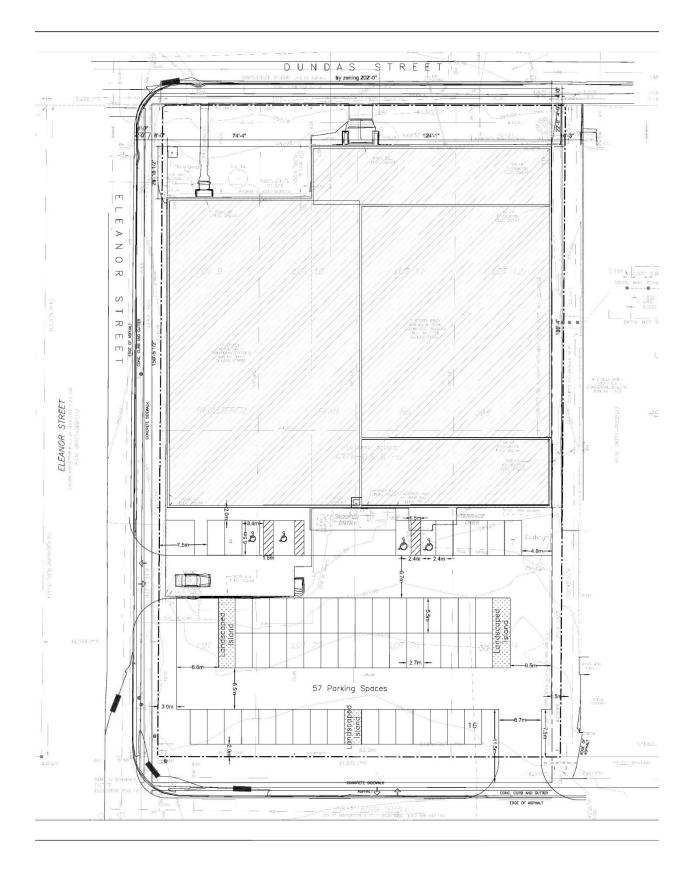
1153-1155 Dundas Street - Revised Conceptual Site Plan
